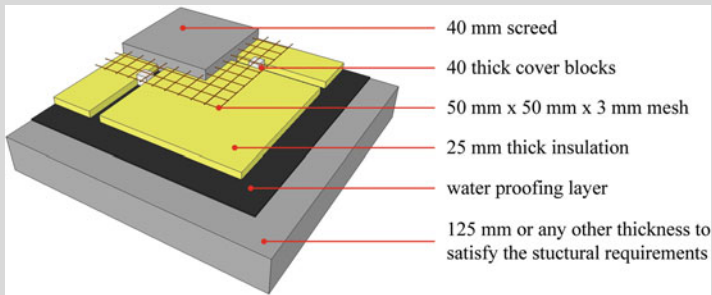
Cross section of the concrete roof investigated by Halwatura and Jayasinghe (Drawing adapted from Halwatura and Jayasinghe (2008))
